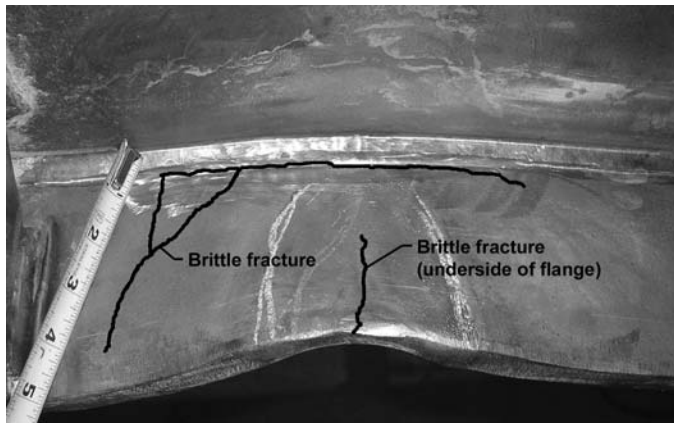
Brittle fracture near Stiffener 1, Specimen 2D/R-2.
